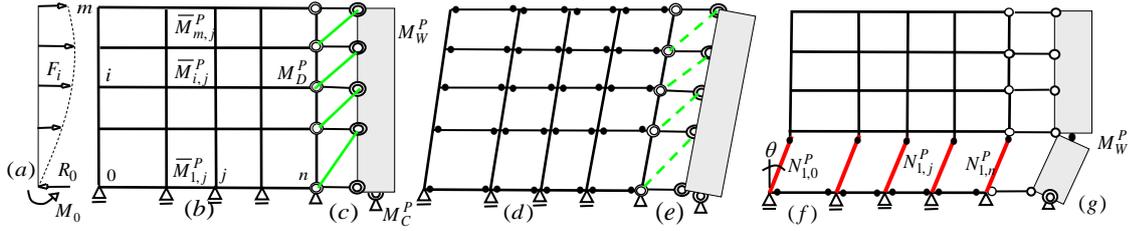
(b) RRMF, (c) RRW, (d) MF failure, (e) BRB failure, (f) Soft story failure, (g) Wall failure
